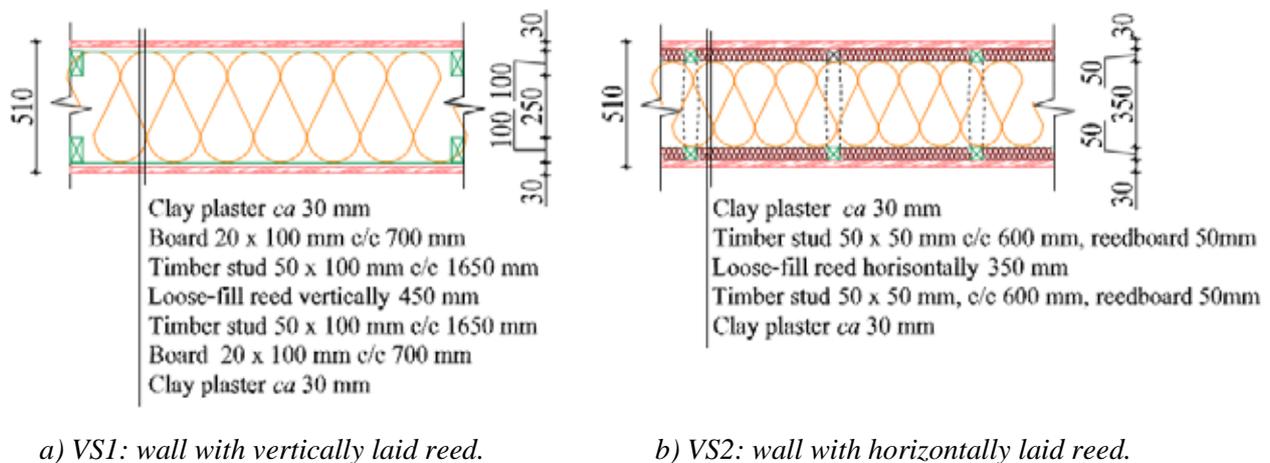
Drawings showing the structure of wall types VS1 and VS2 in cross-section.
